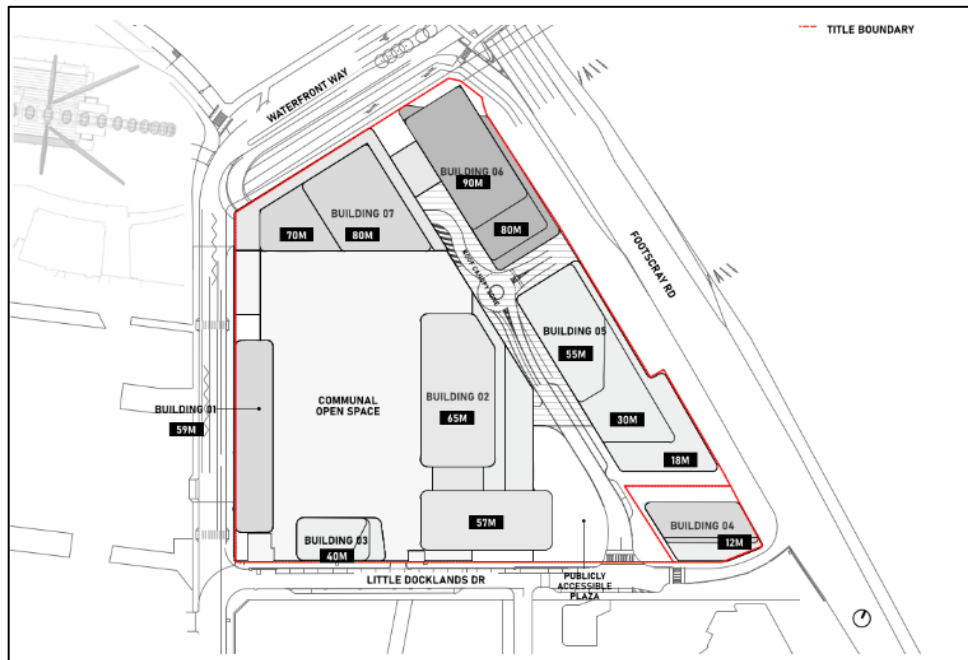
Concept Plan 5 - Maximum heights, Roof plan (source: The Waterfront City East Development Plan)
